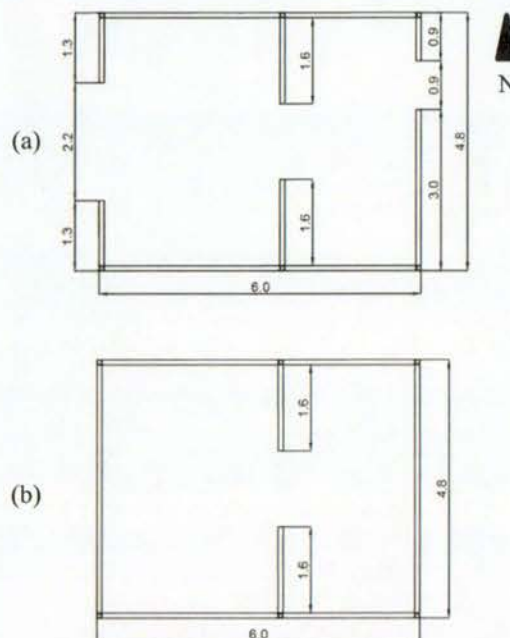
Plan view of the modelled CLT structure [5]: a) First story b) Second story
